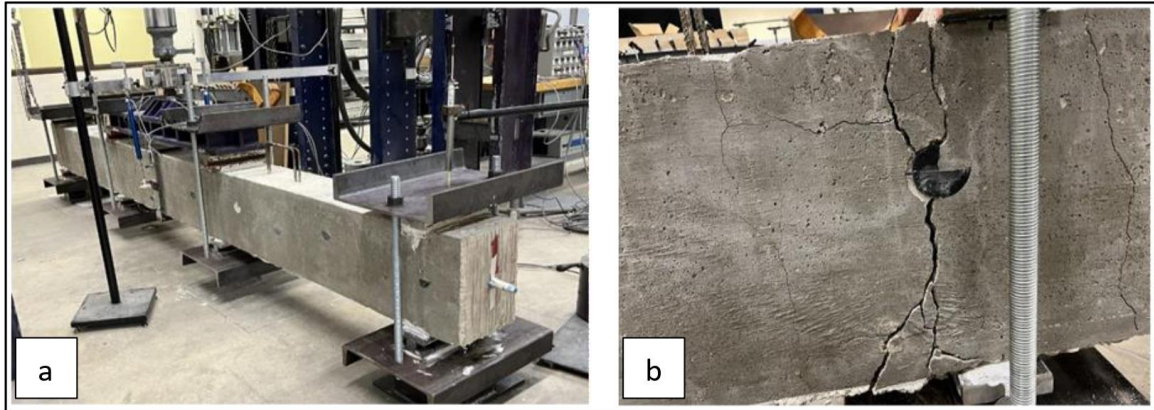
Specimen No.1. (a) before testing. (b) at failure
